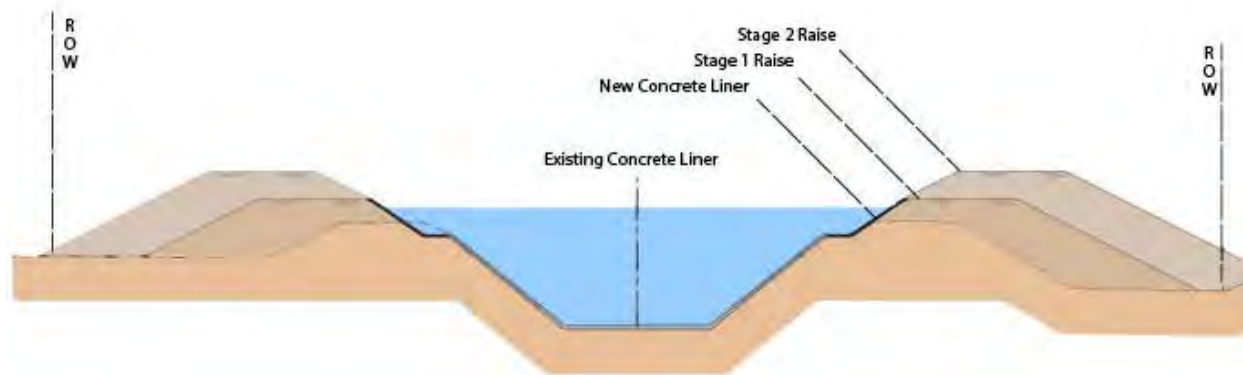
Typical Canal Enlargement Cross Section with 10-ft Slope Stability Bench
